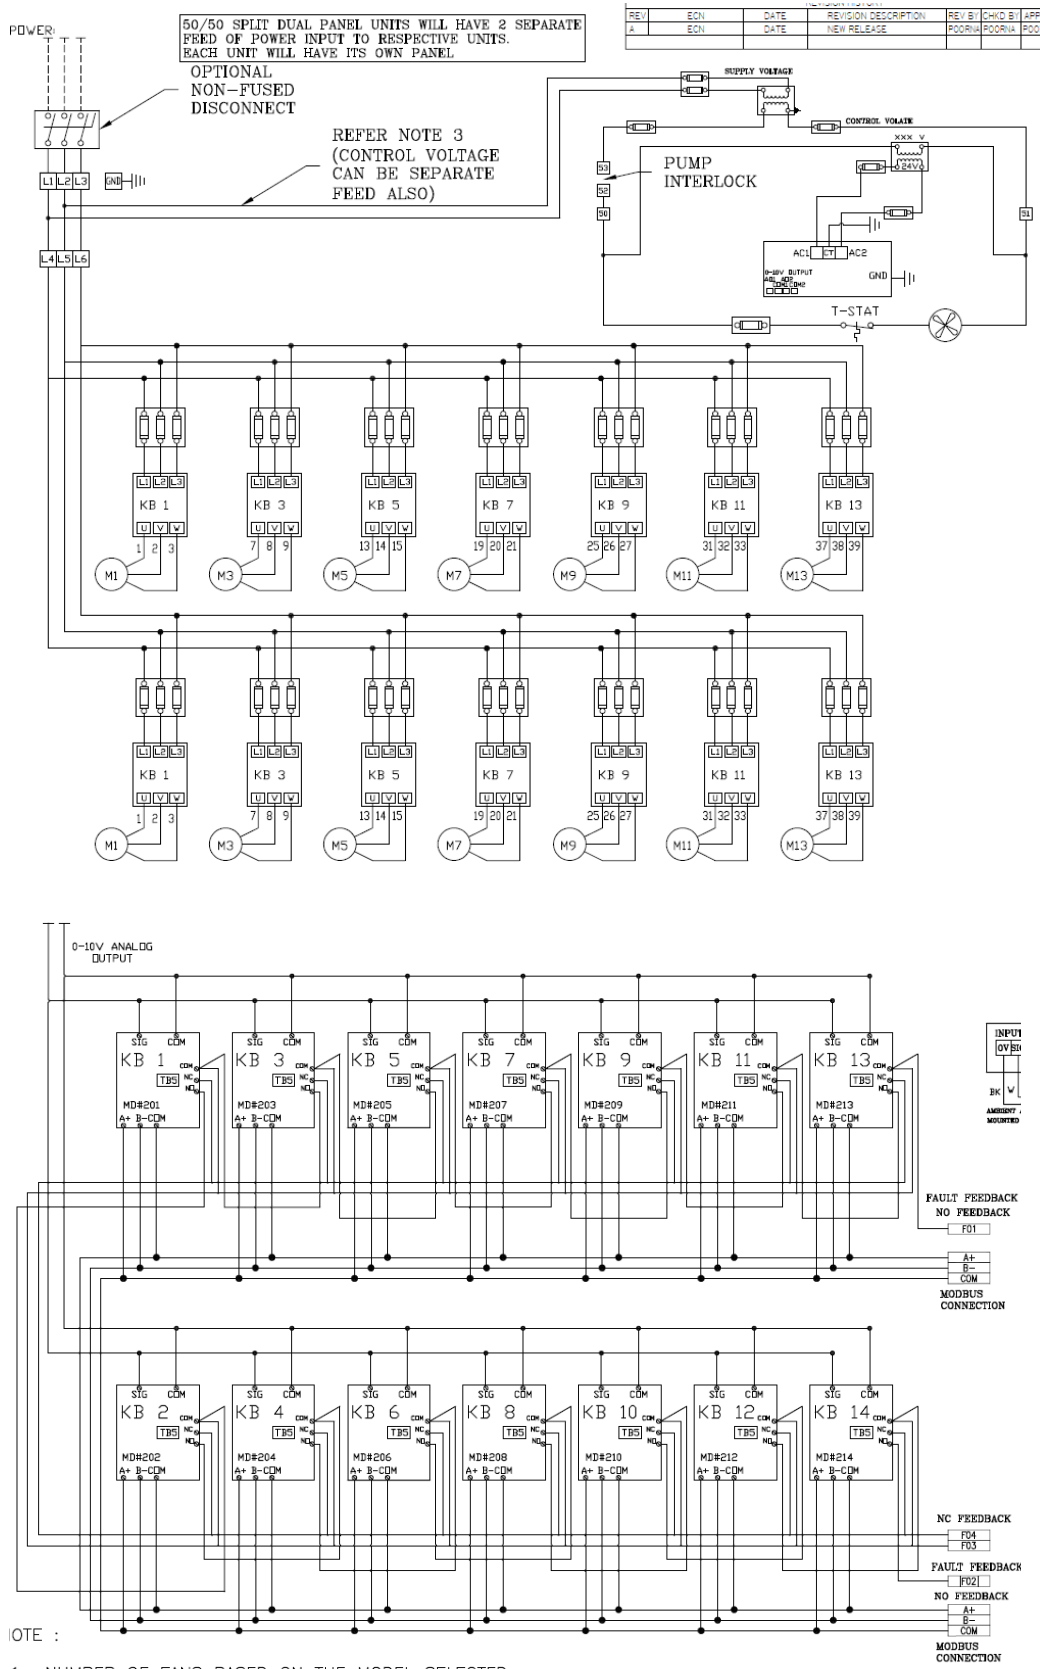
Typical Two Wide Unit Drawing with K Motor
